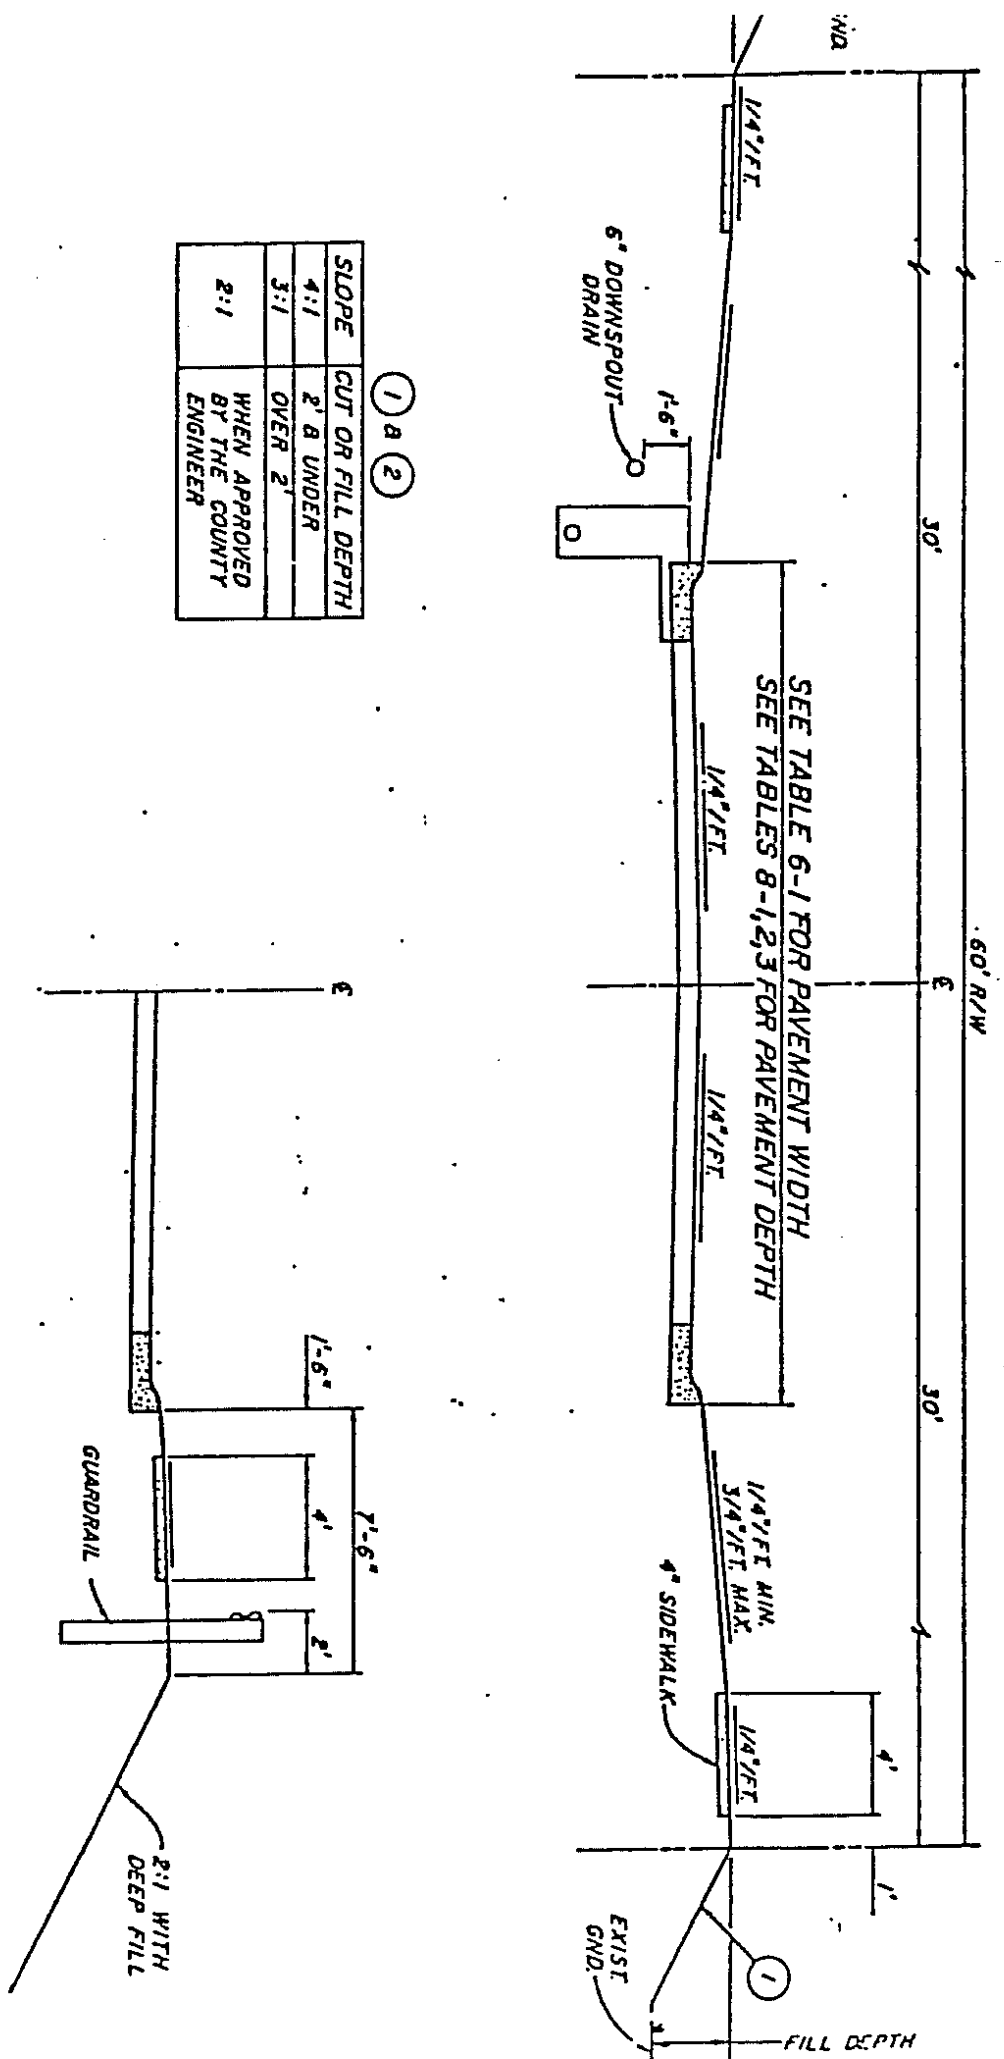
Urban Typical Section with Curb and Gutter
